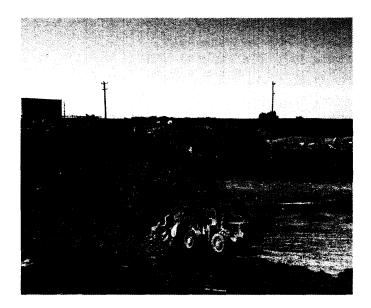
TEREX 7251 LOADER HAULING BLASTED ROCK TO CRUSHER; NAPANEE QUARRY (LOOKING SOUTH).
